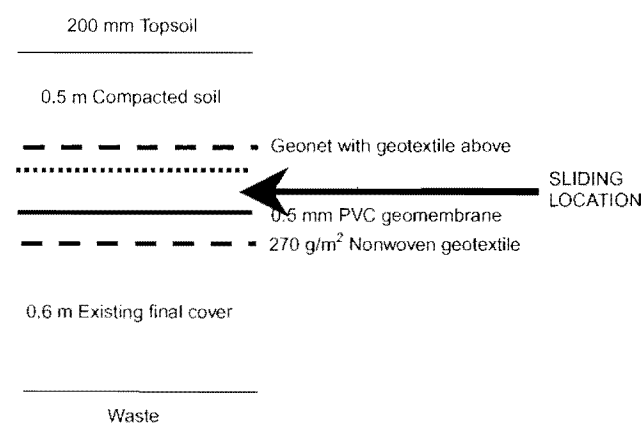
Original final cover system design with unbonded geotextile below geonet
